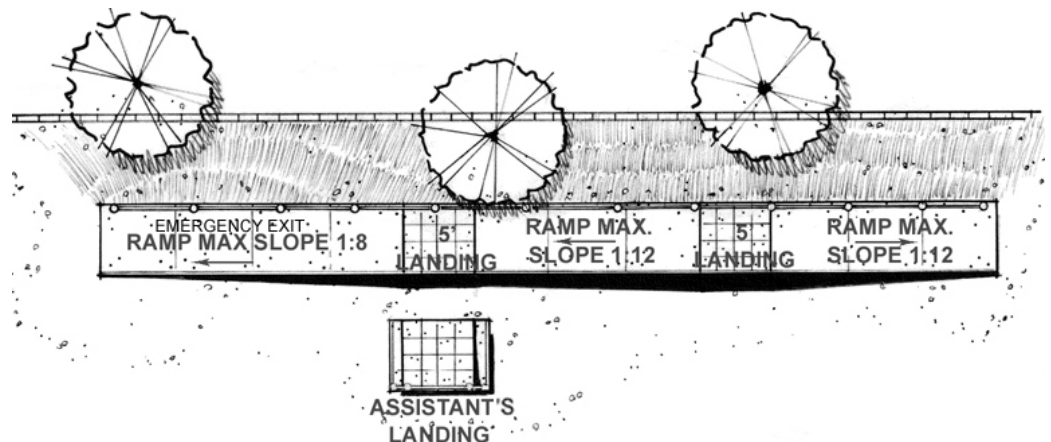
LAYOUT OF TYPICAL ACCESSIBLE EQUESTRIAN MOUNTING RAMP
